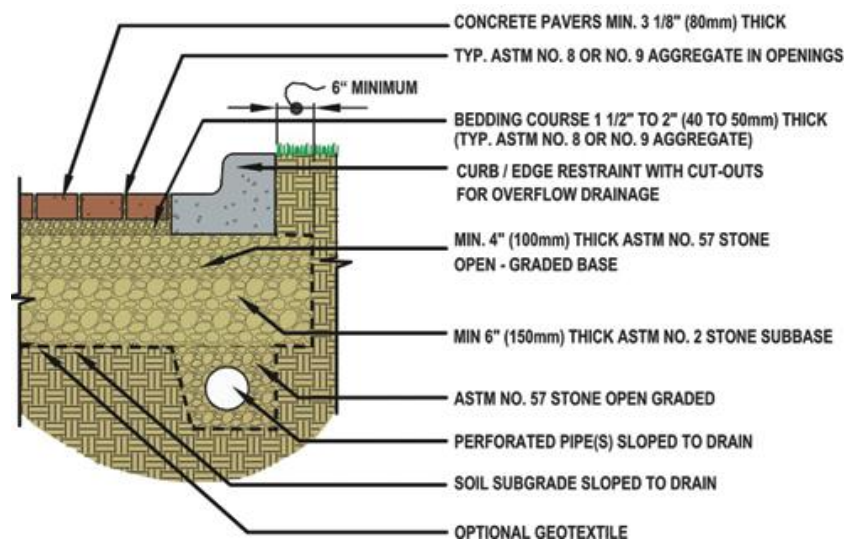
Installation of permeable pavement with water treatment and detention (Source: www.rainwaterpillow.com).
